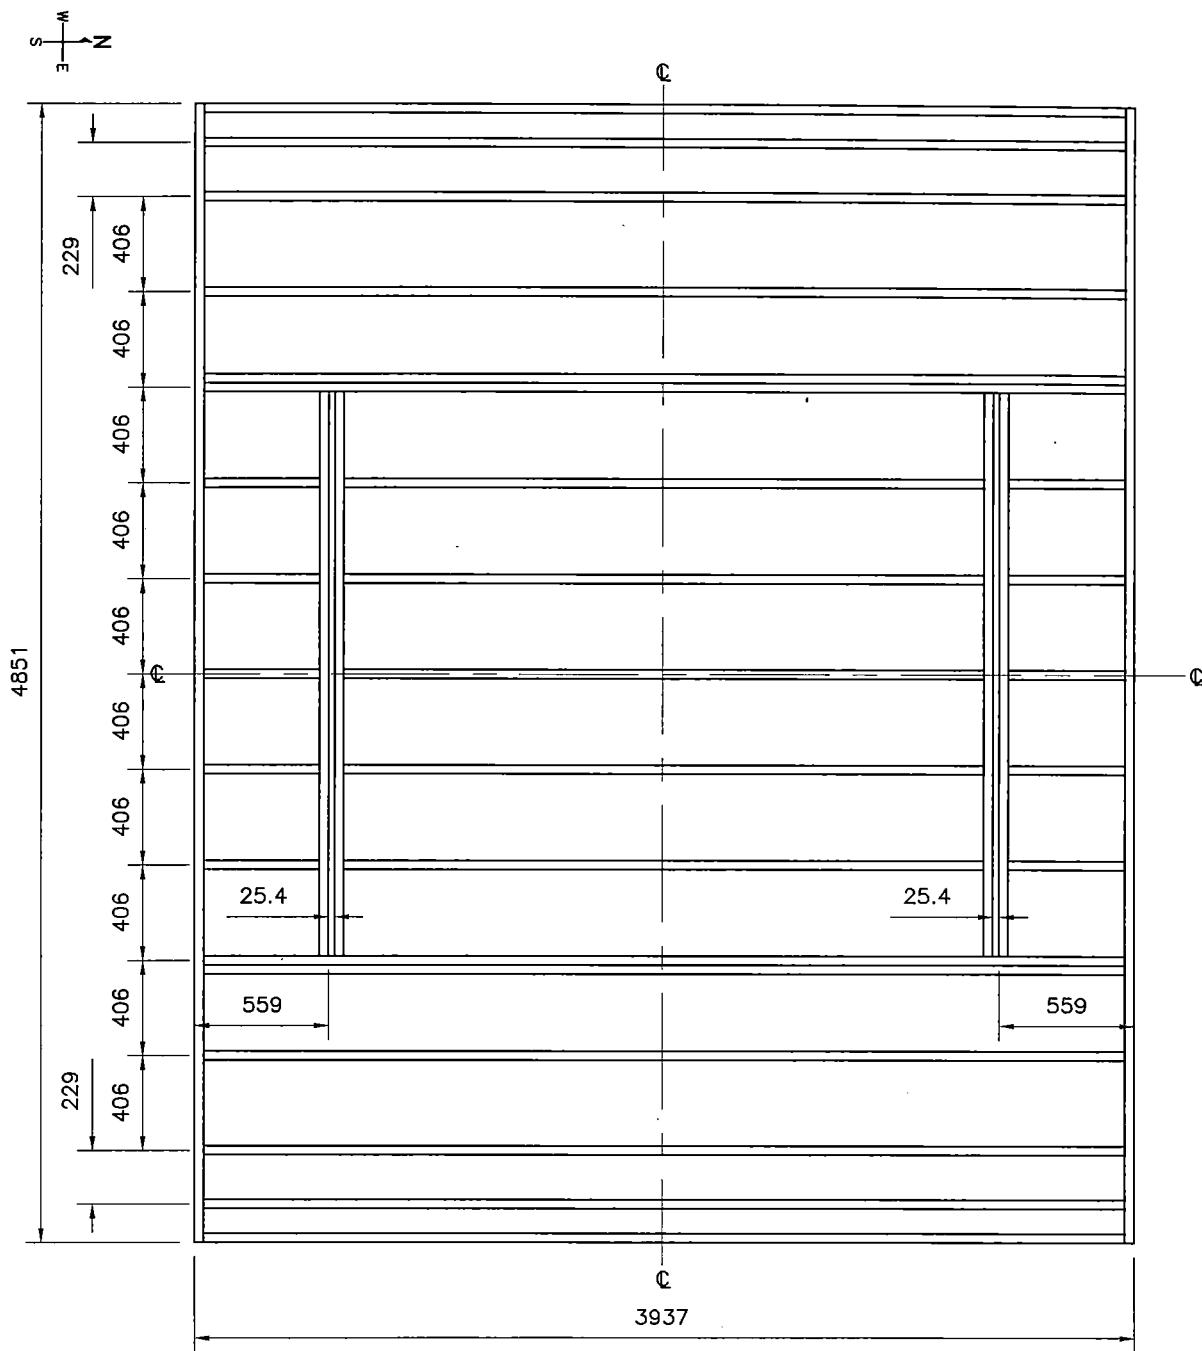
Assembly No. 1, Gypsum Board Base Layer Layout
